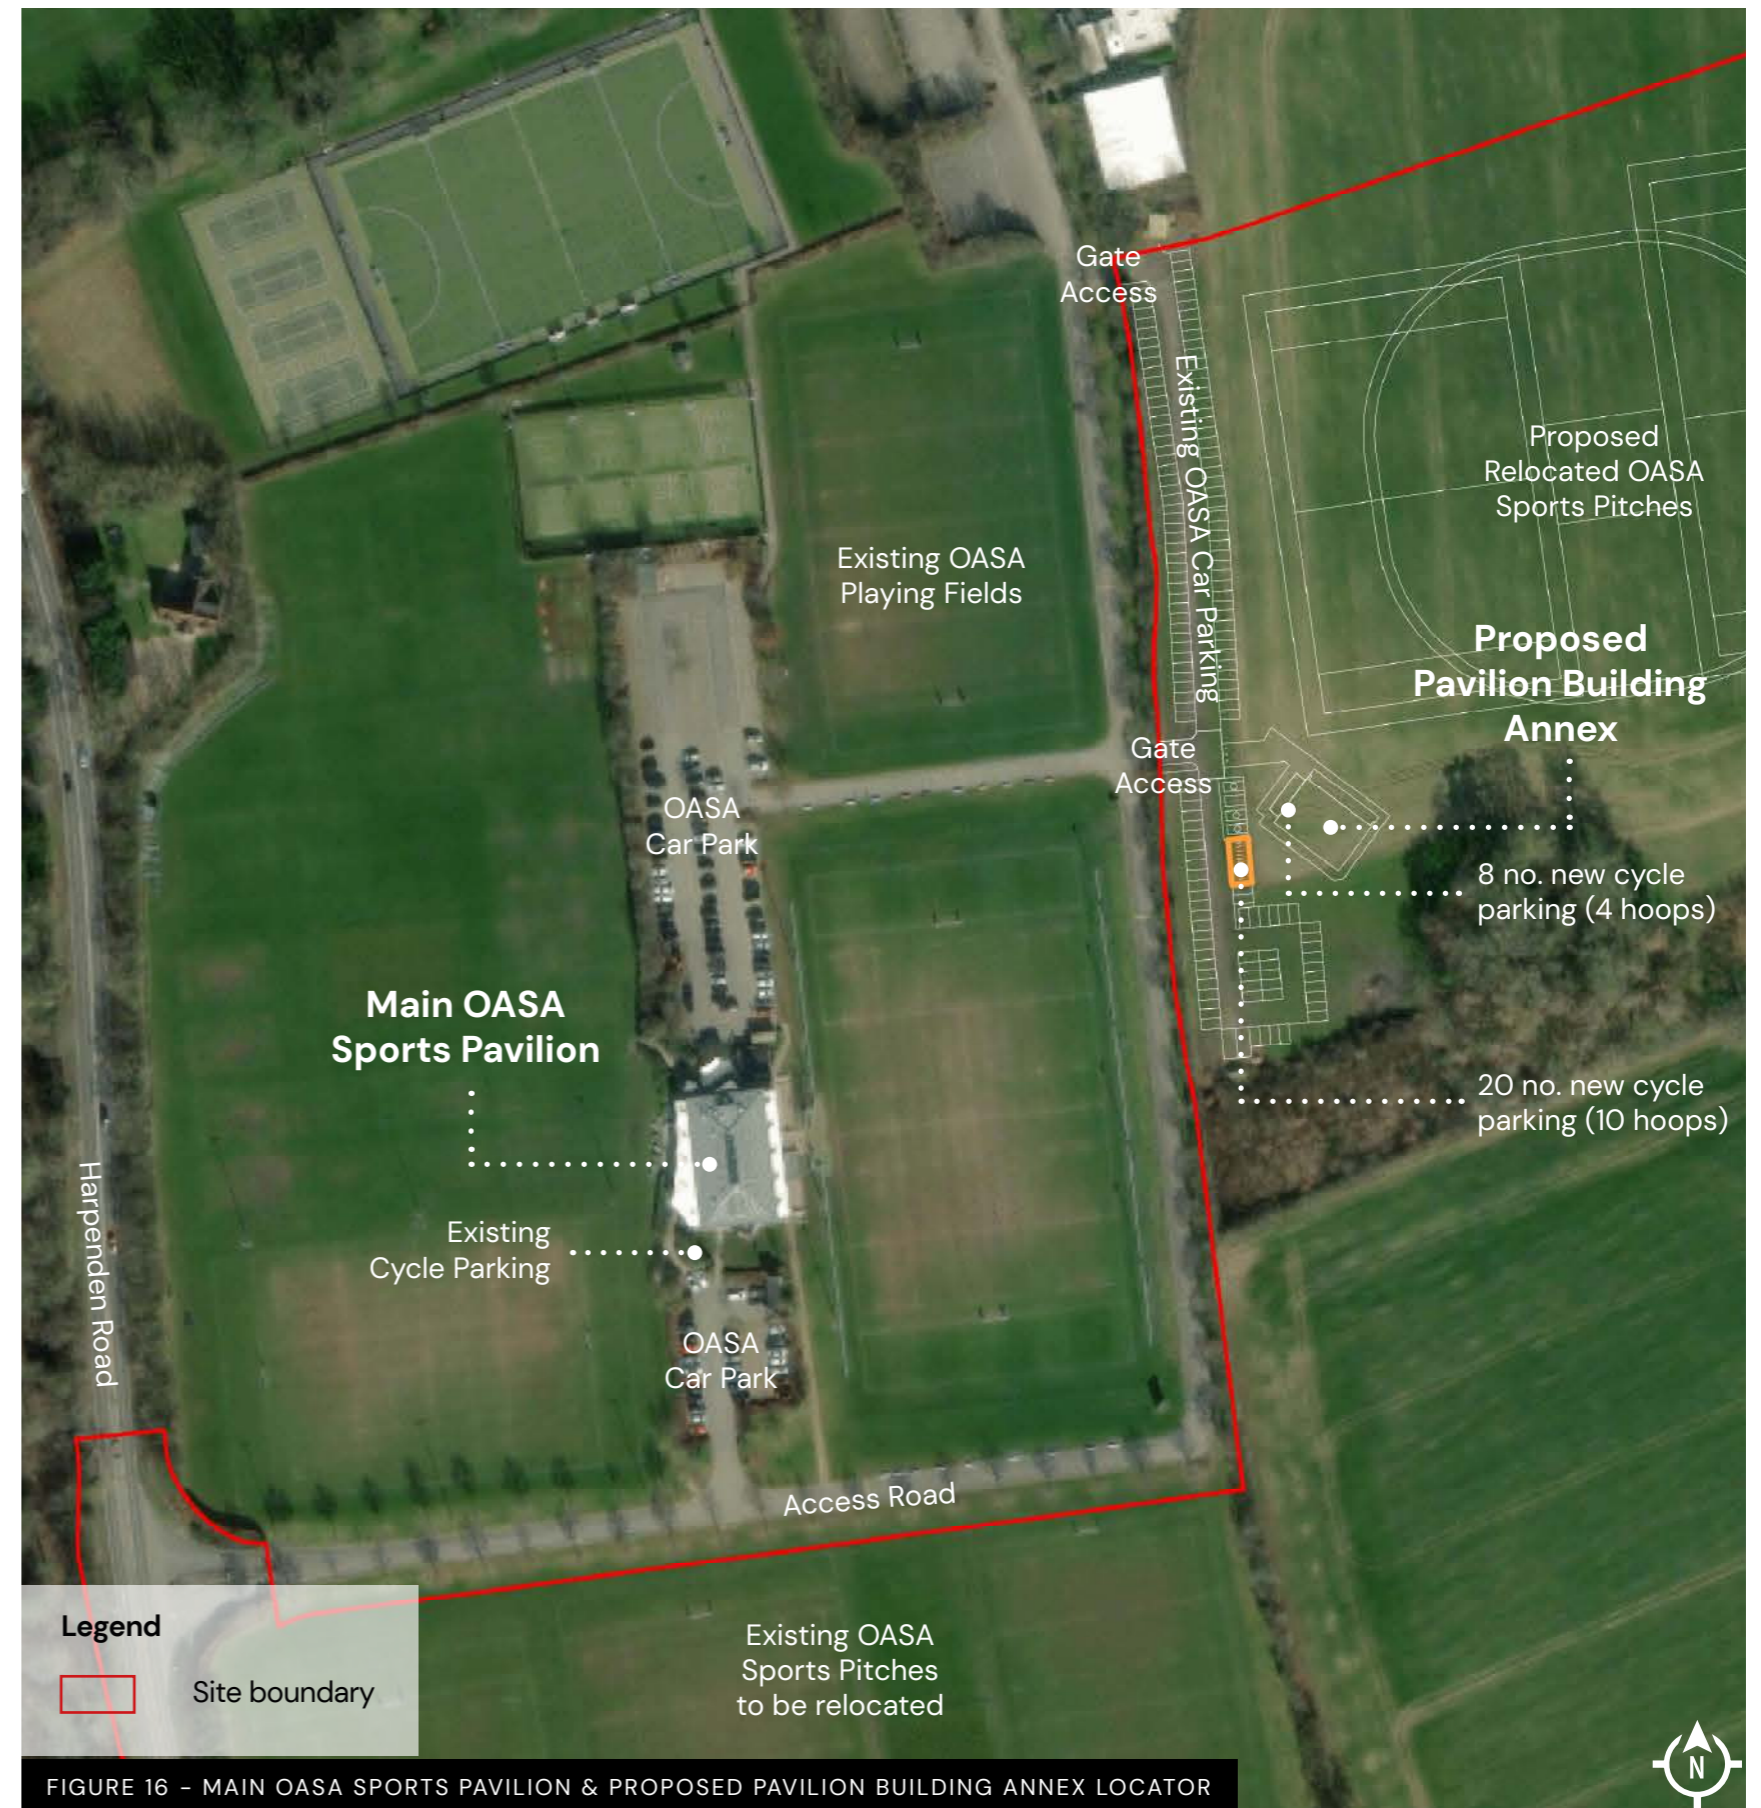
MAIN OASA SPORTS PAVILION & PROPOSED PAVILION BUILDING ANNEX LOCATOR
